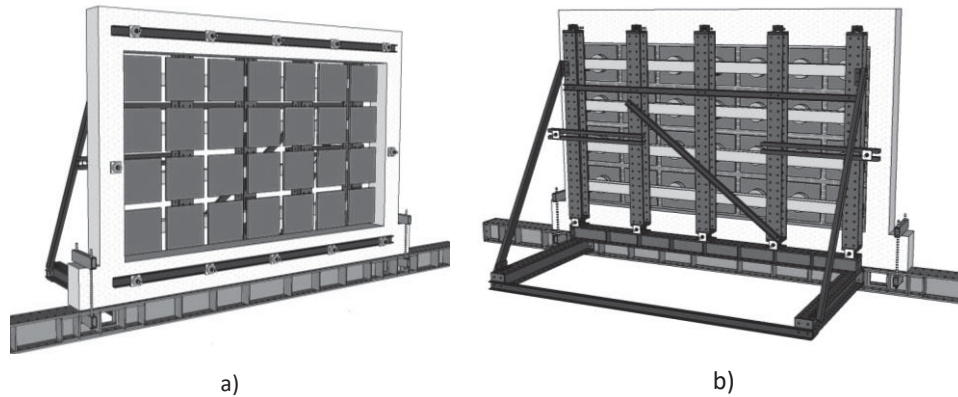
Layout of the OOP test setup using pneumatic actuators: a) front and b) near view.
